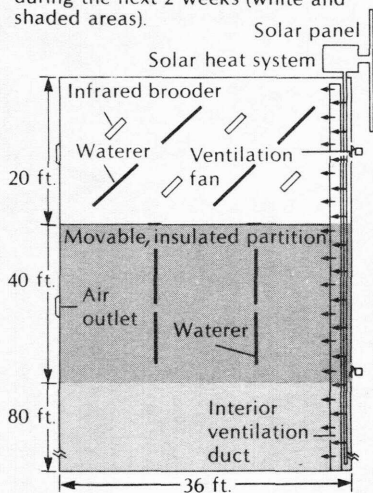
Floor plan of brooder house showing arrangements for one-fourth of the house for the first 2 weeks of rearing chickens (white area) and one-half during the next 2 weeks (white and shaded areas).
